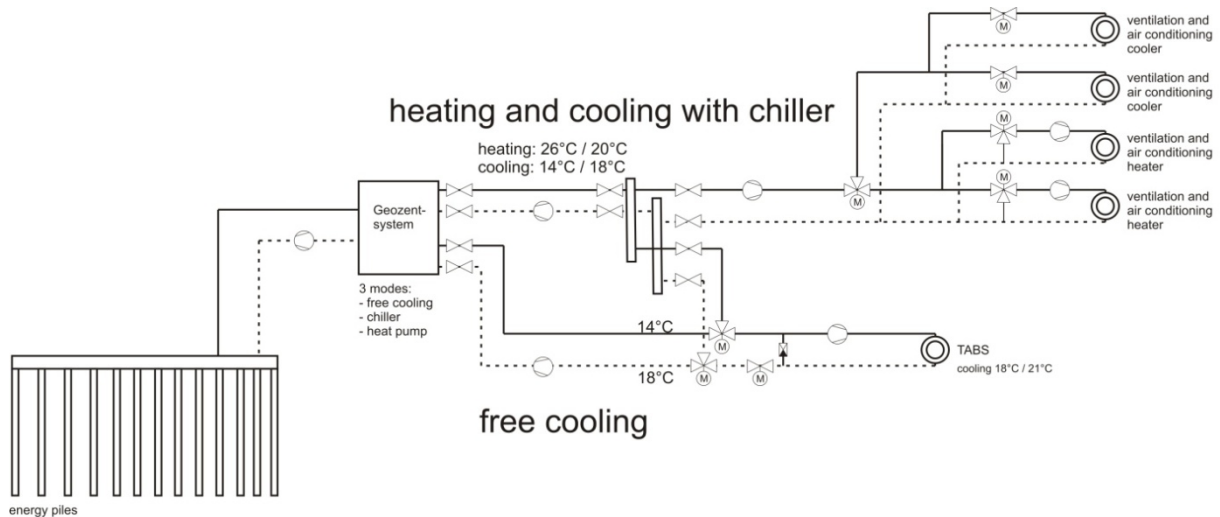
Hydraulic scheme of the geothermal heat pump system of building B
